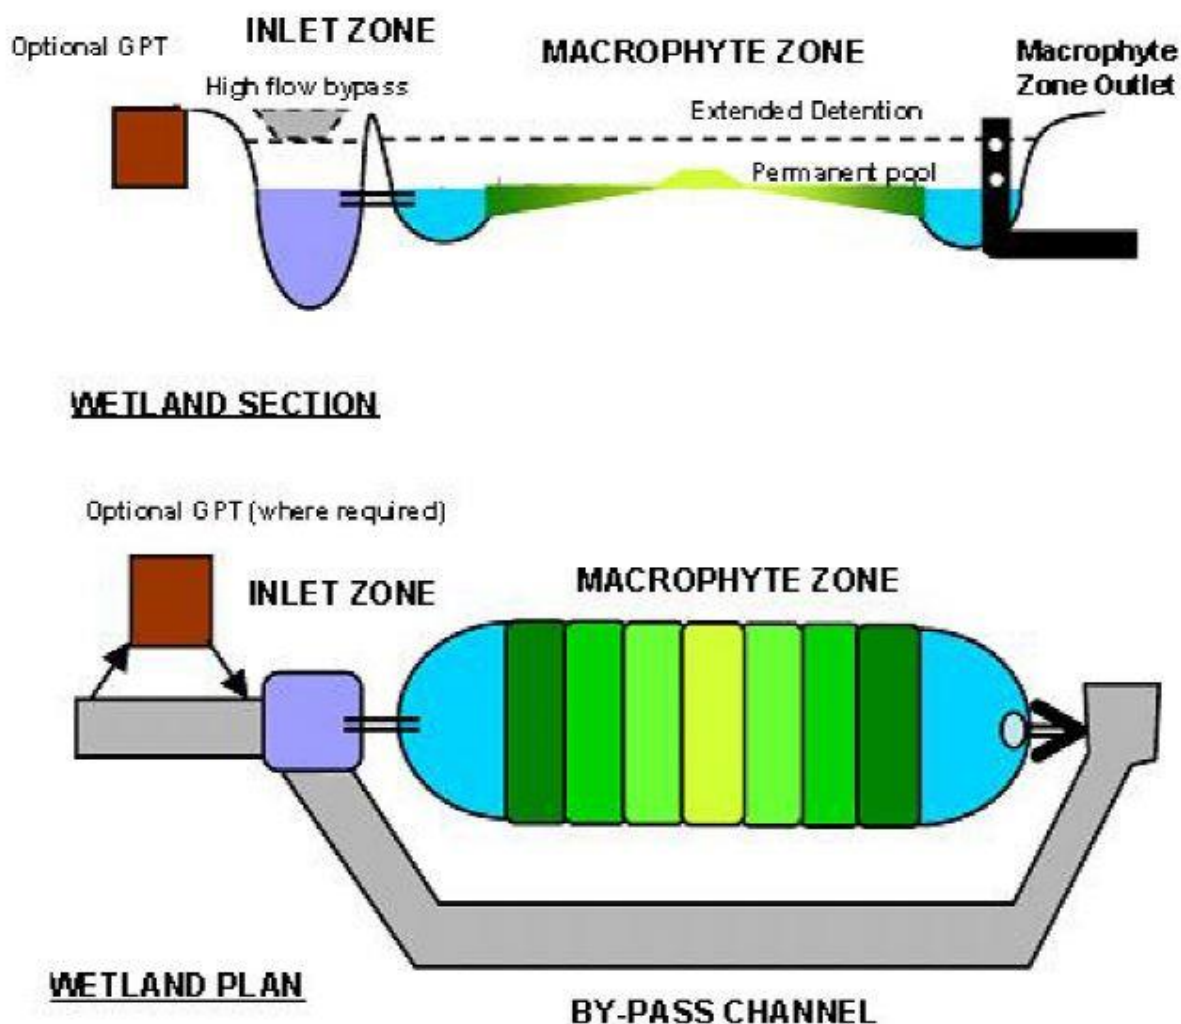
CONSTRUCTED WETLAND TYPICAL LAYOUT
